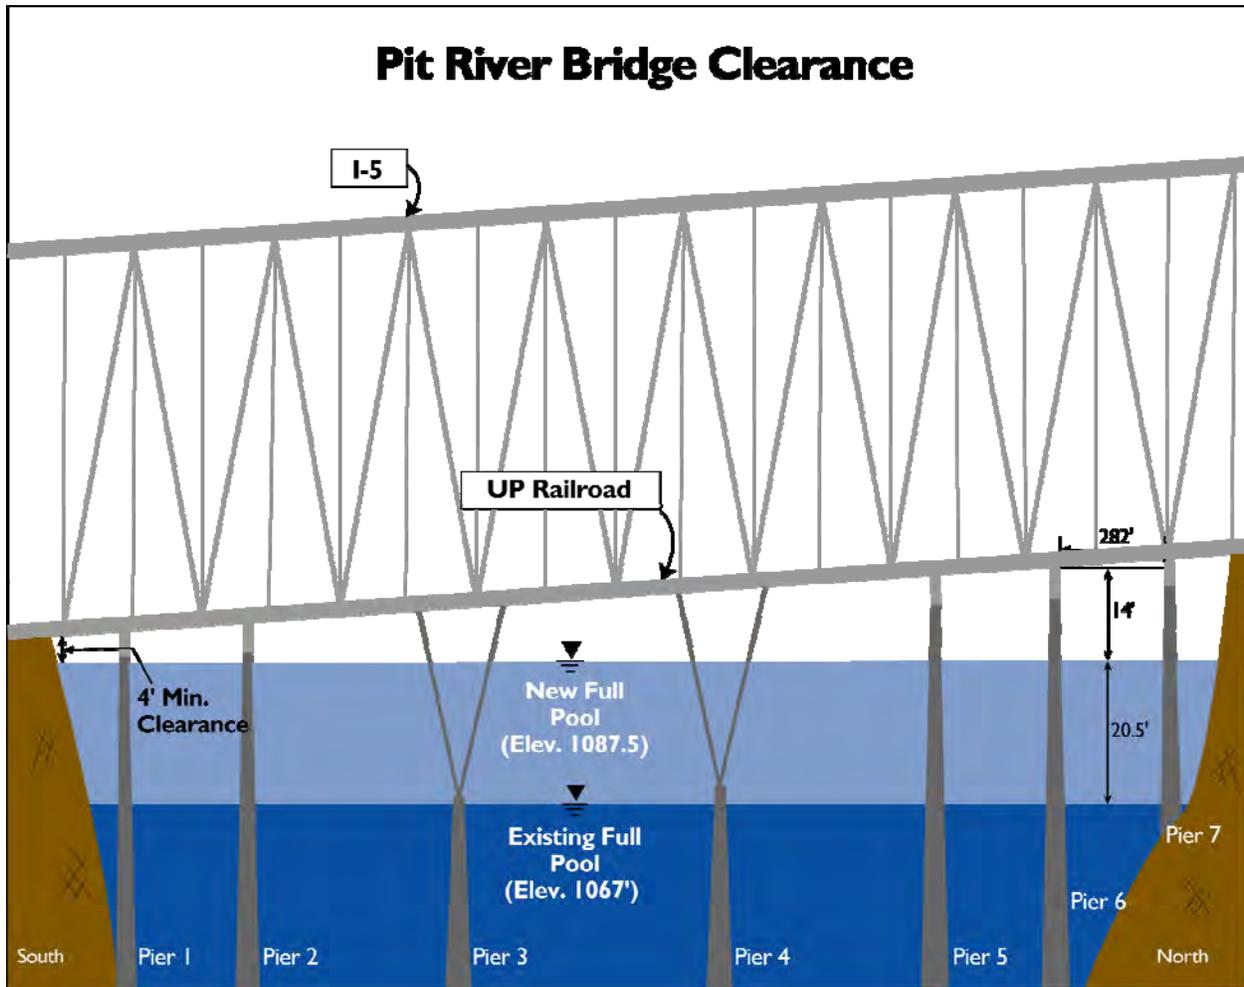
Minimum Clearance for Boat Traffic at Pit River Bridge, Full Pool with 18.5-foot Dam Raise
